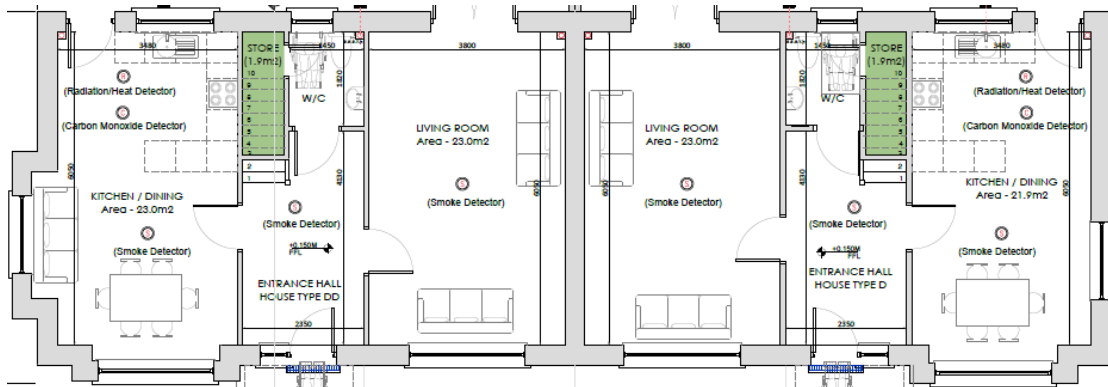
Ground floor plan of House Type DD (left) and House Type D (right)
